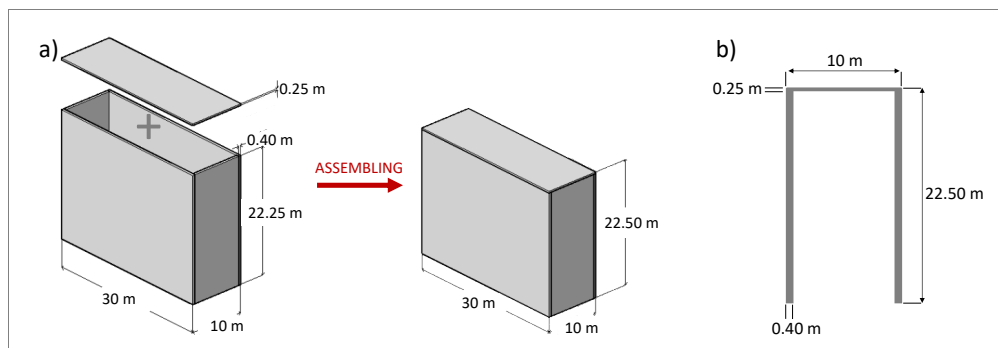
Structural characteristic of each watertight hollow caisson of the VLFS: a) 3D view and b) cross section view.
